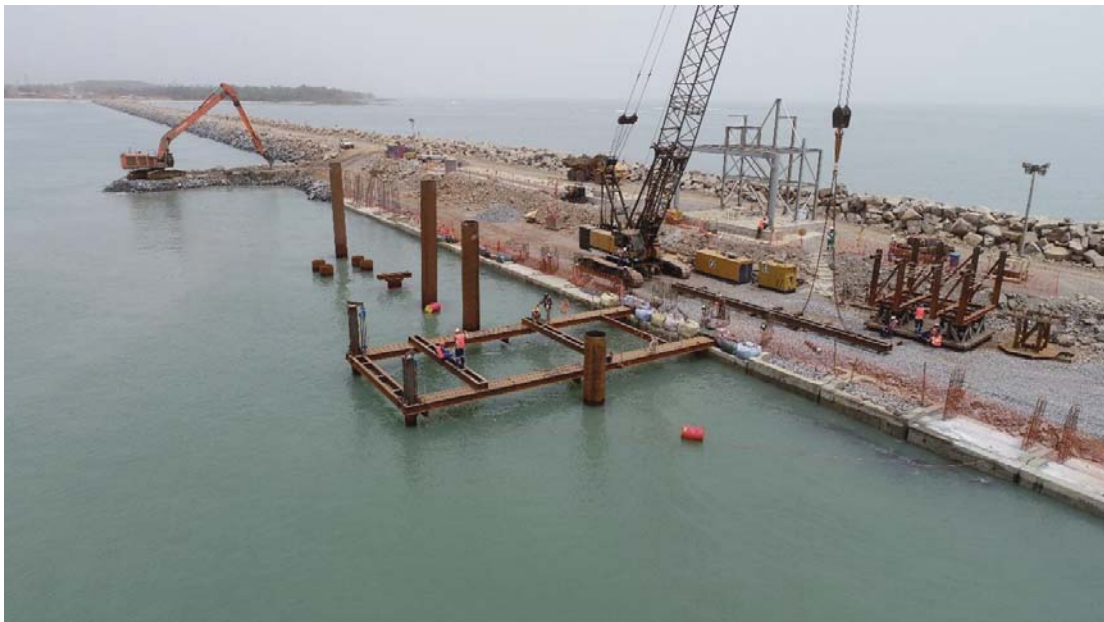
Piling frame – Guinea, Cape Verga, Bauxite Export Port 2018
